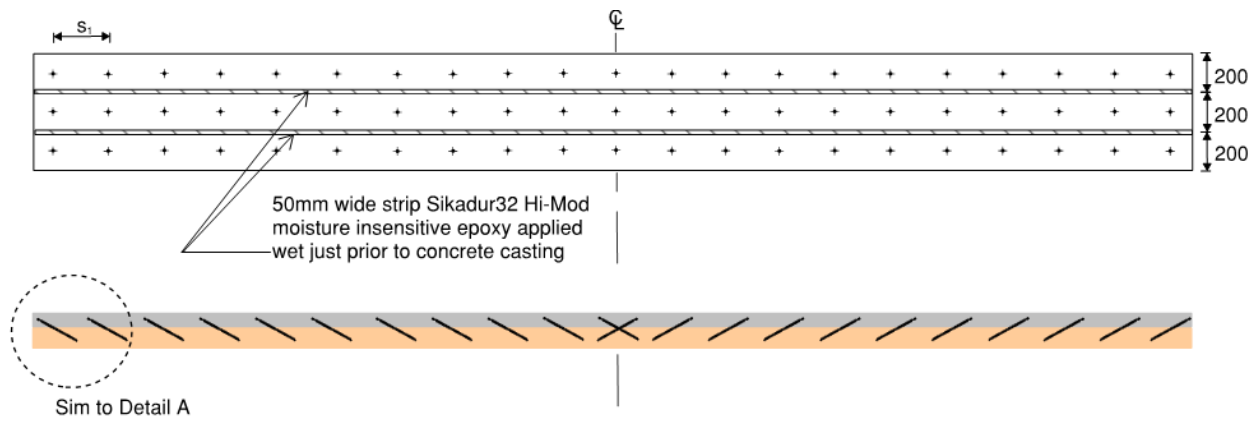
Layout of typical panel with adhesive layer and inclined STS (Type 3)
